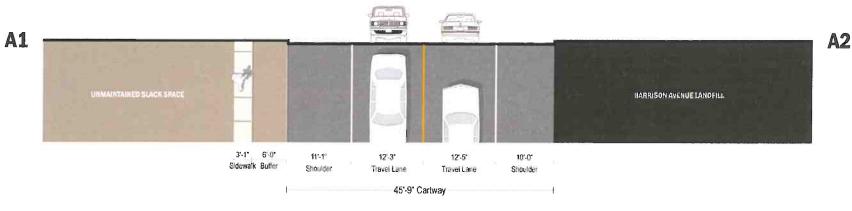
Existing State Street between Centennial Drive outlet and State Street Bridge
